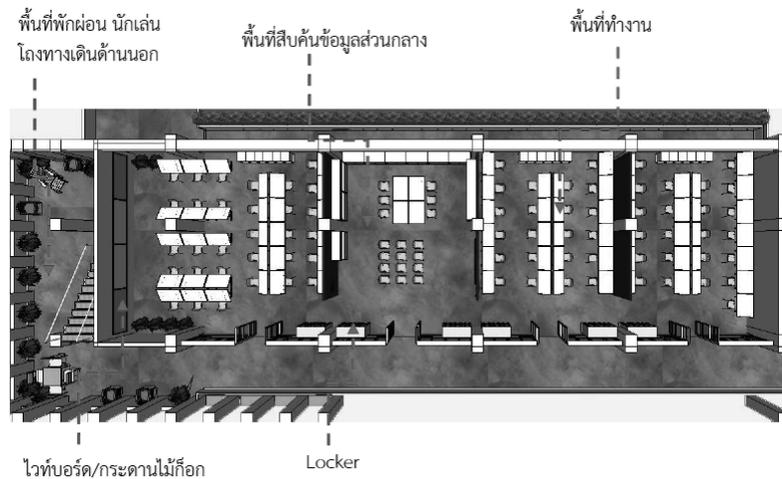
Furniture lay out AR-412-1/AR-412-2 (Floor 4) studio type.1
